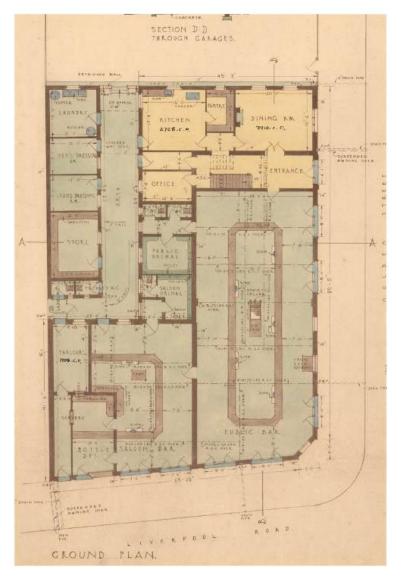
Architects Copeman and Lemont's ground floor plan of the new (and existing) Ashfield Hotel prepared in 1926 for Tooth & Co Ltd.
